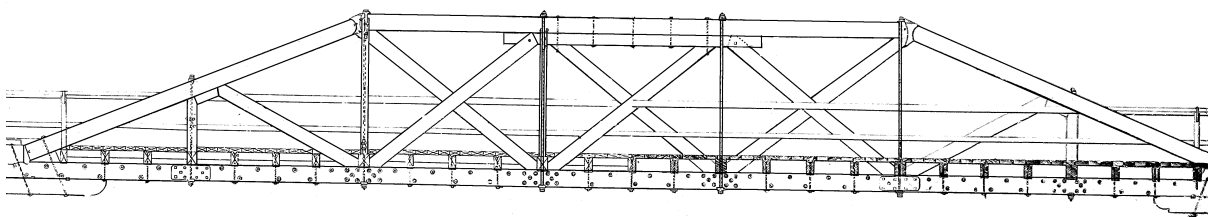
Clarence Town Bridge, Old PWD, Designed 1878, Two Truss Spans of 100 ft each.
